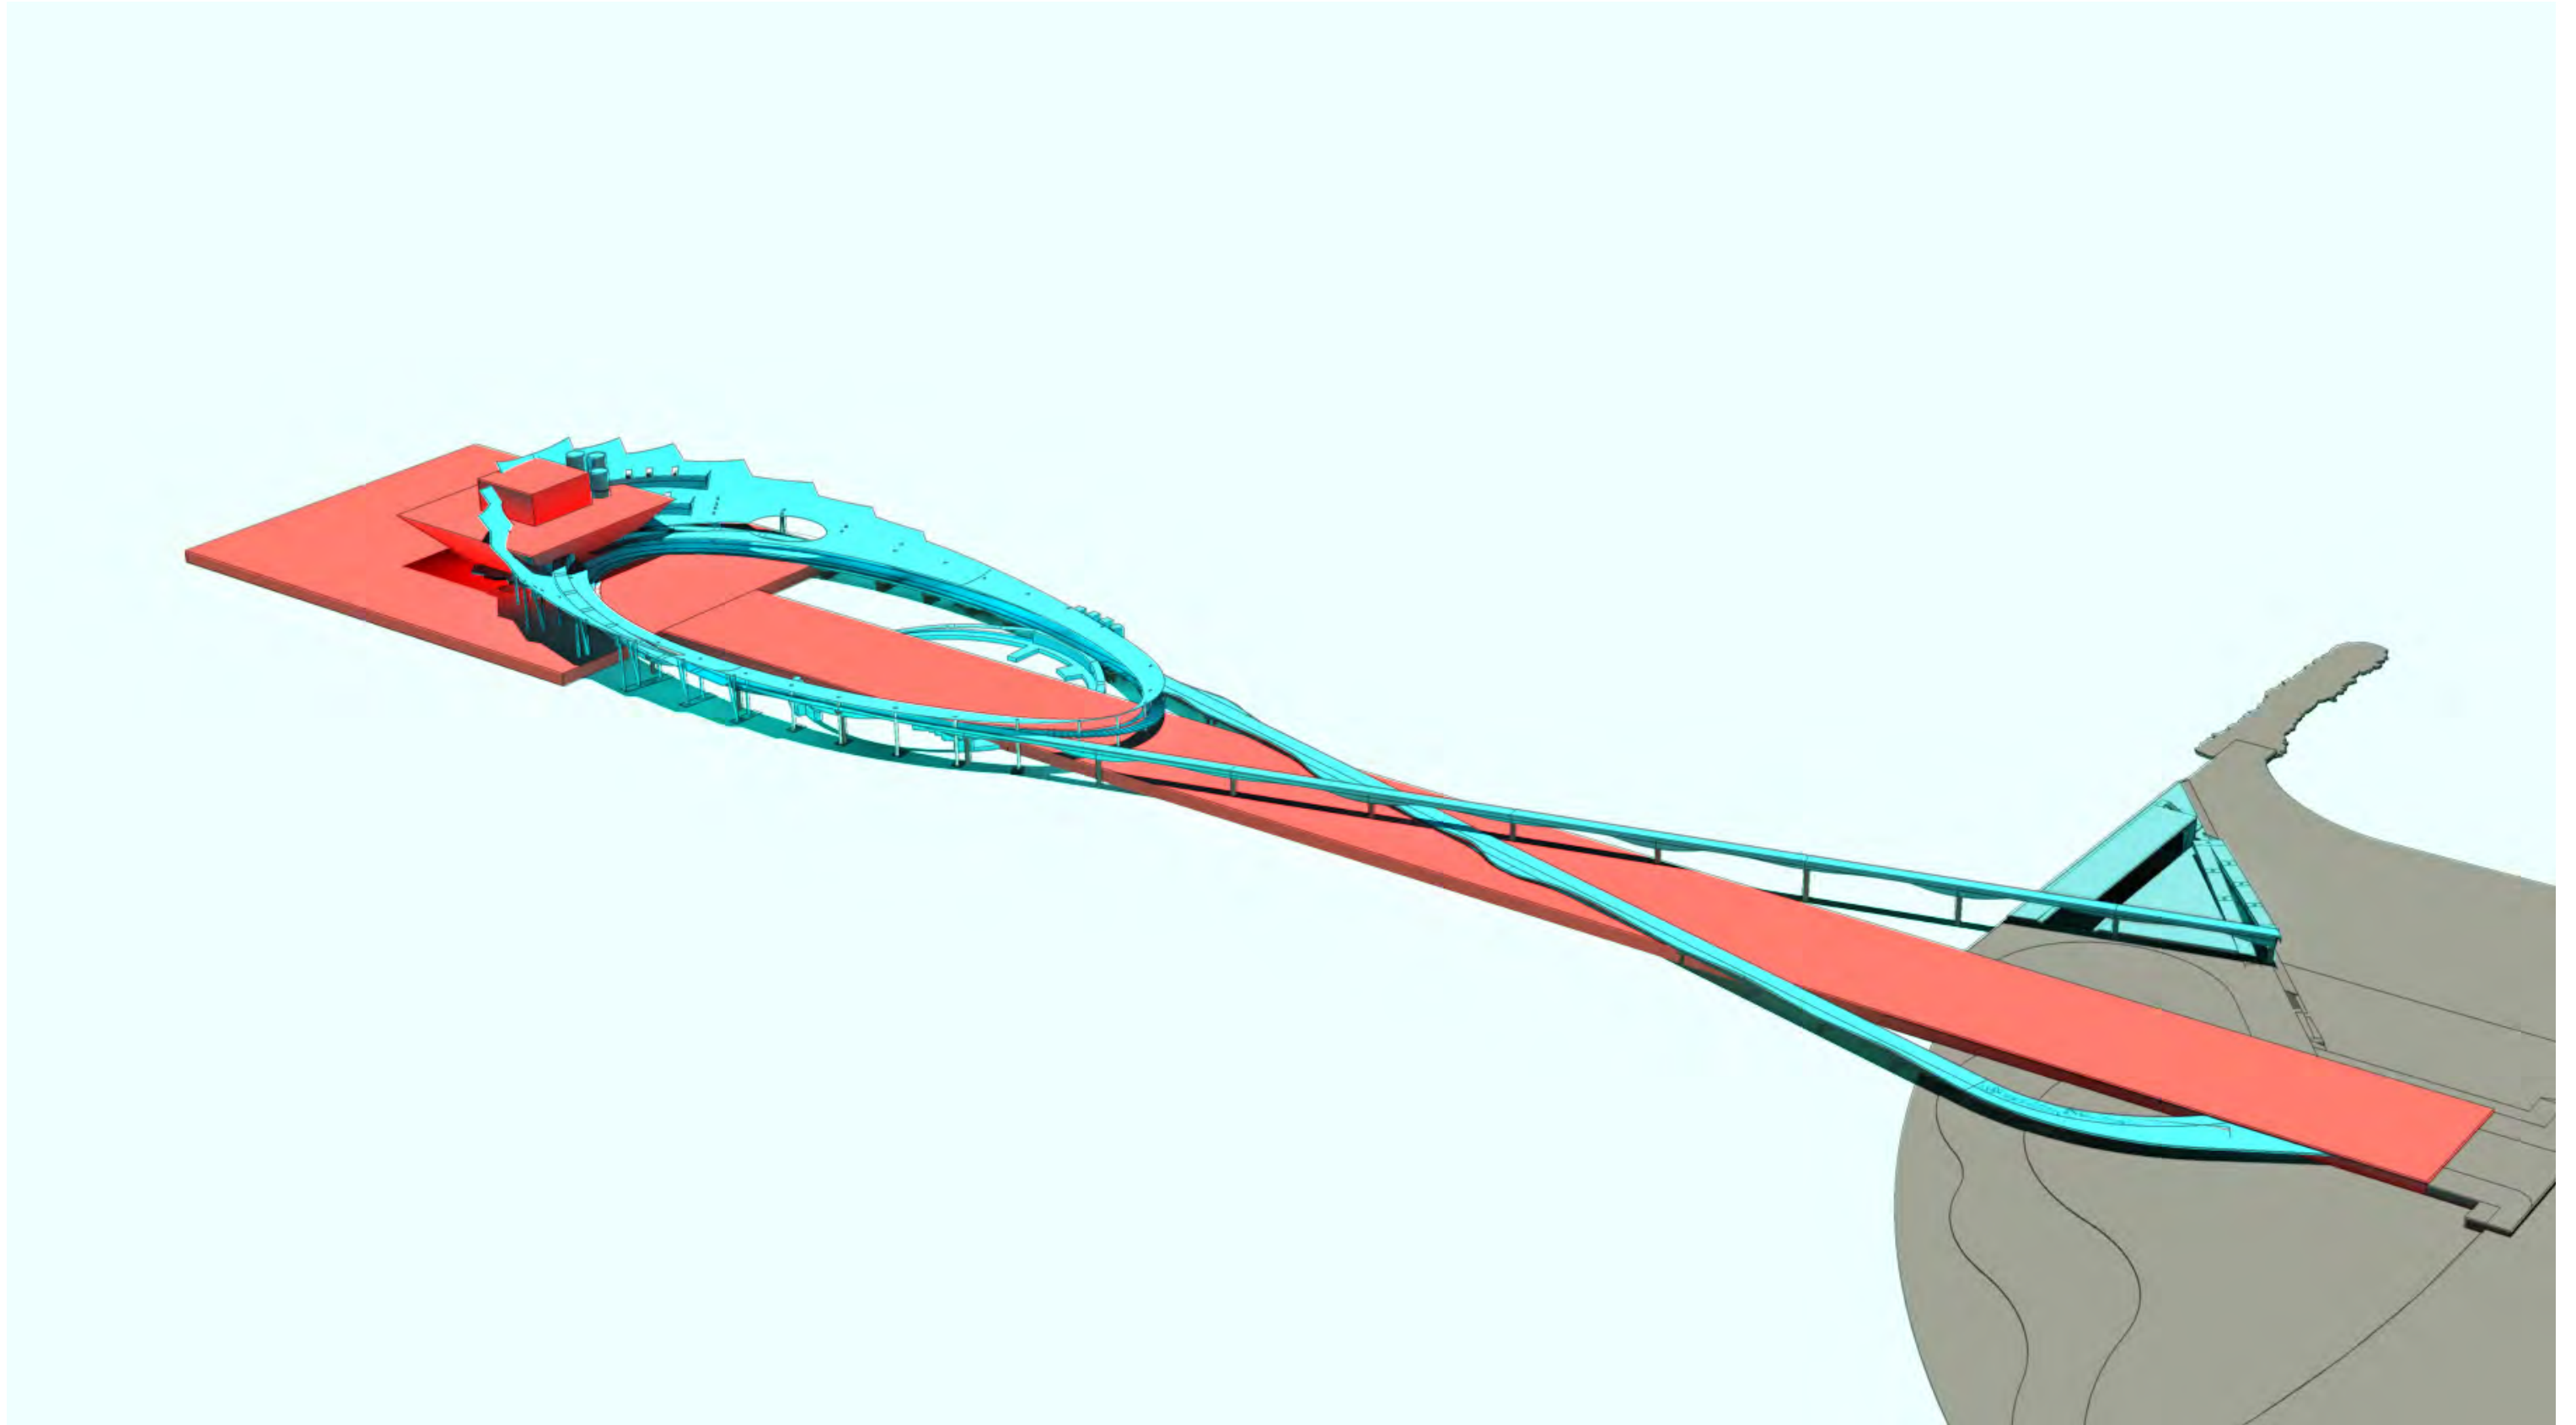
Comparison of Existing Inverted Pyramid Building and New St. Petersburg Pier
